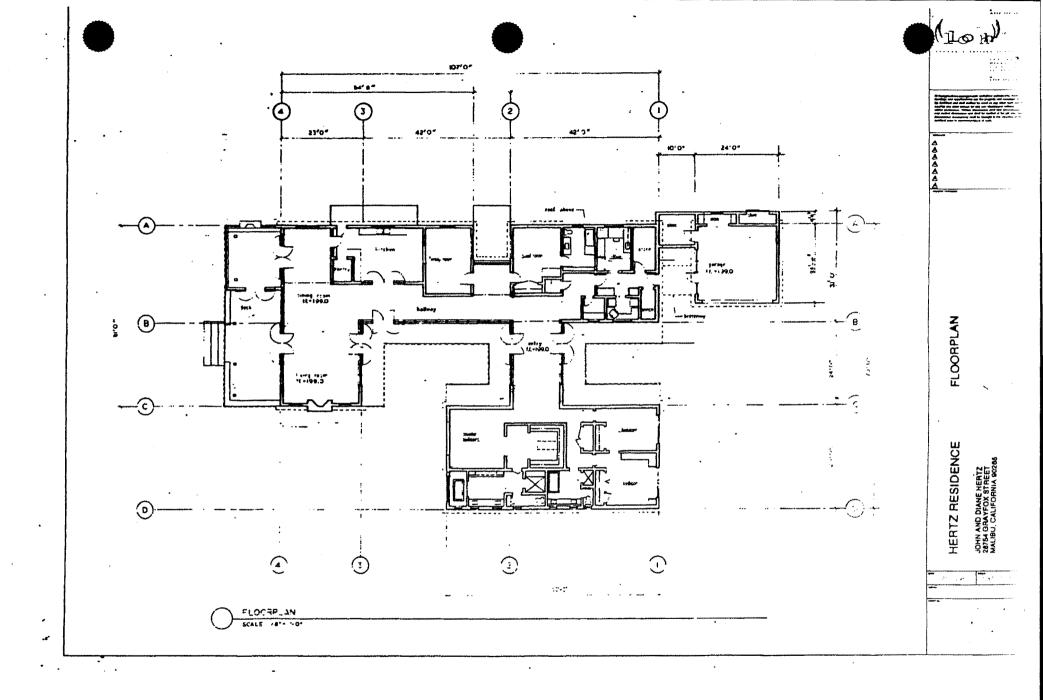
(4-97-088) Floor Plan for Proposed Single Family Residence
